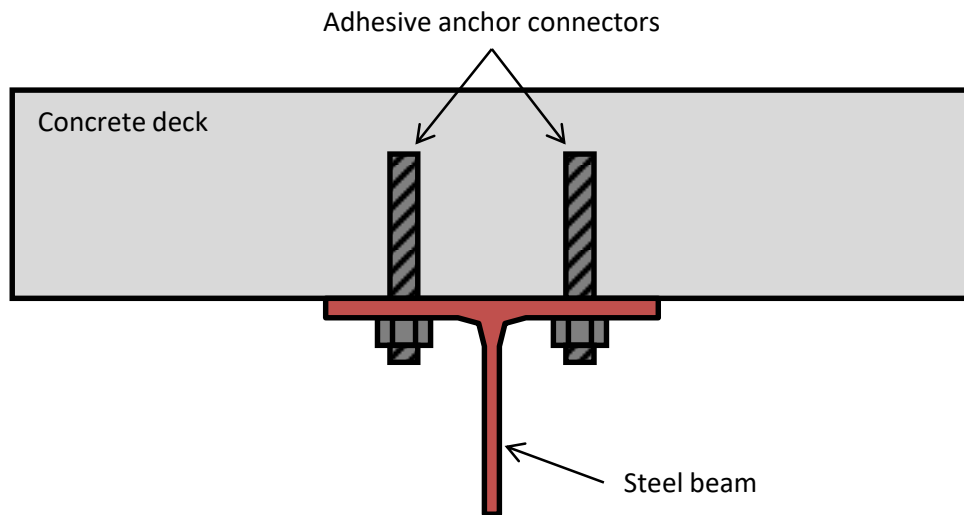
Adhesive Anchor Post-Installed Shear Connectors
